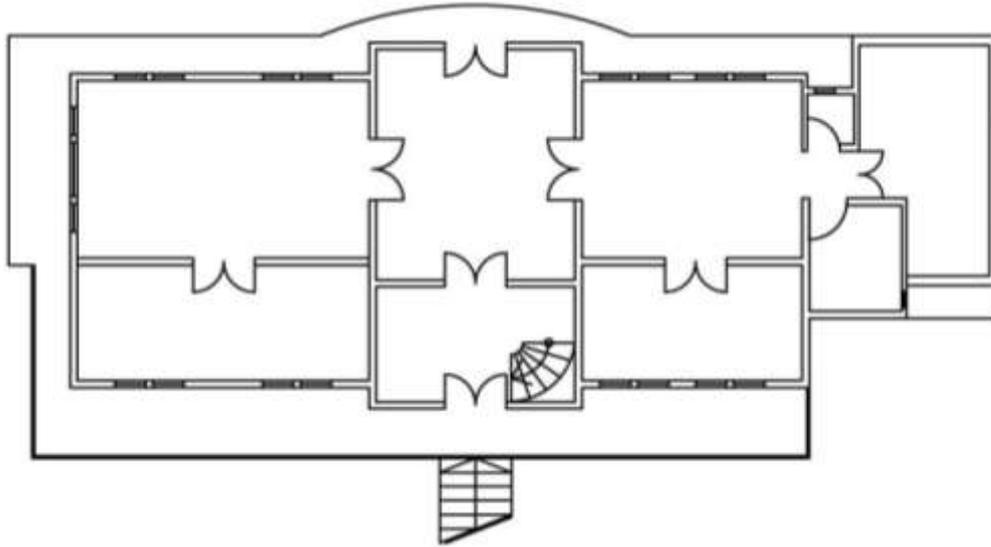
First floor plan of the house at 122 lot 14 parcel
